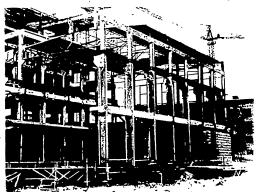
Lagend Construction of the frames of a TETs in precast concrete
